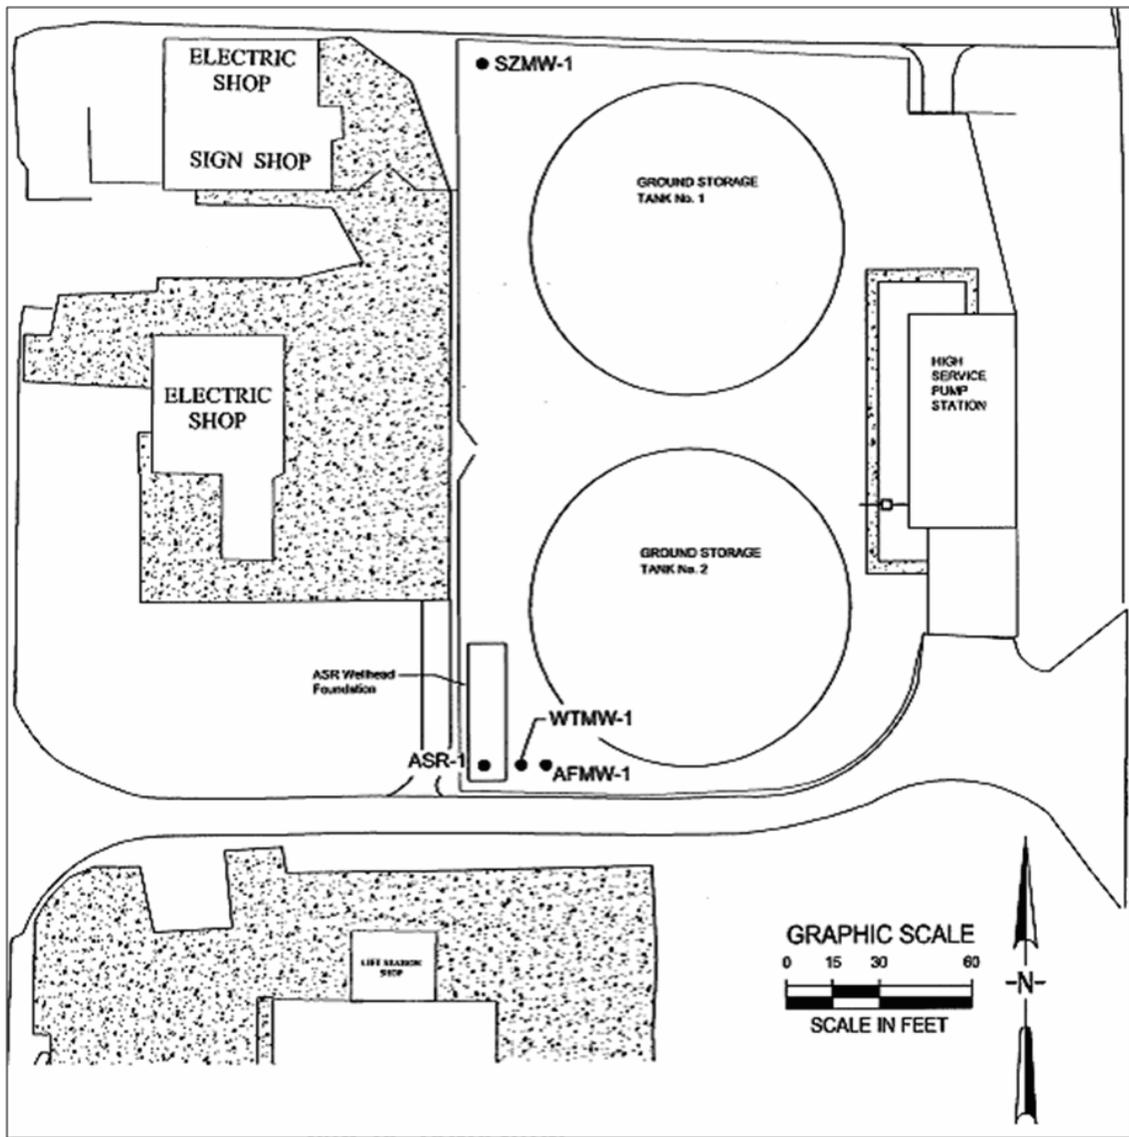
Site plan (modified from Jones Edmunds (20))
